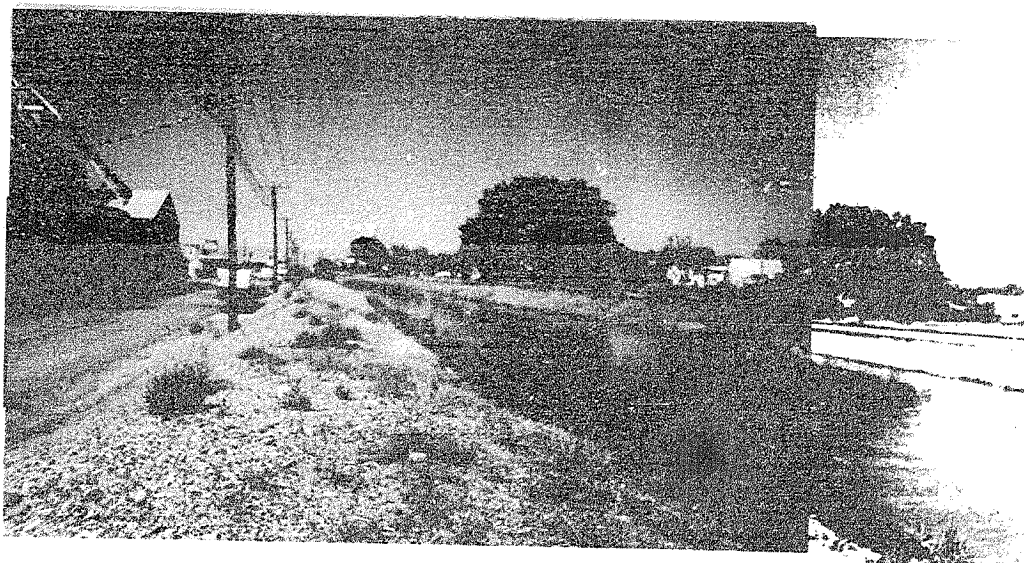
DIRT EMBANKMENT SEPARATING WAREHOUSE AND GARLAND CANAL, LOOKING SOUTHWEST.
